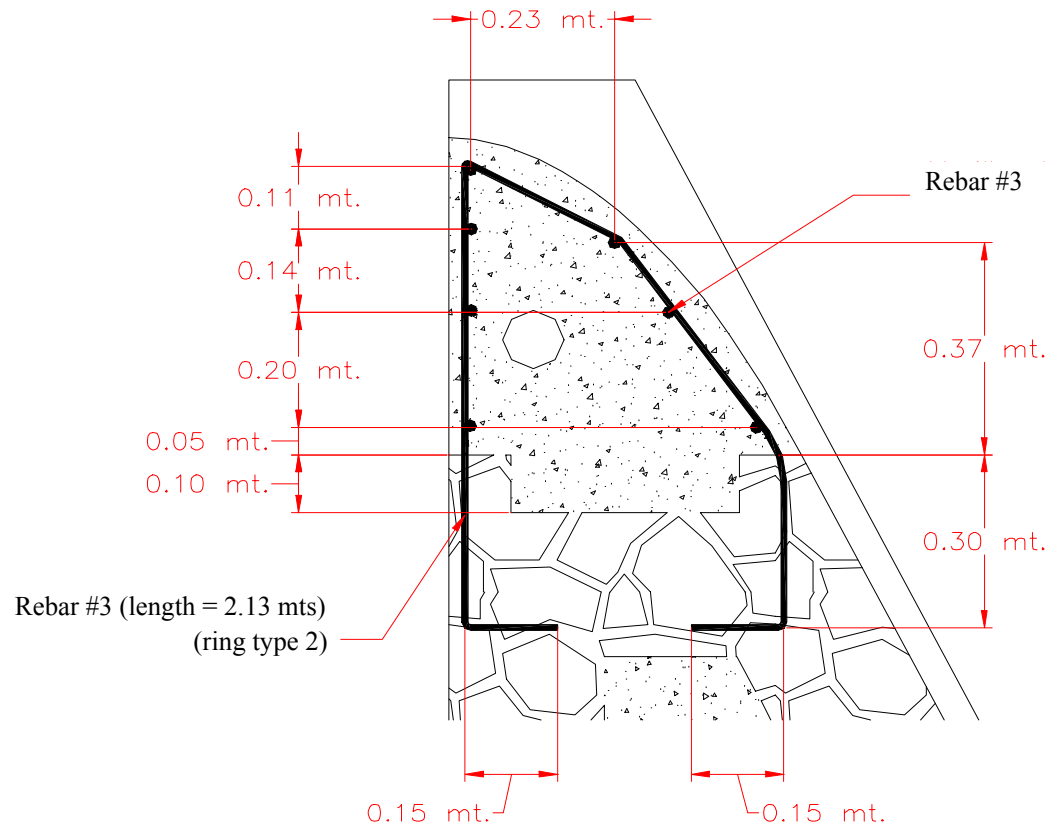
Profile view cross section "A" of dam with details on trough and rebar arrangement.
